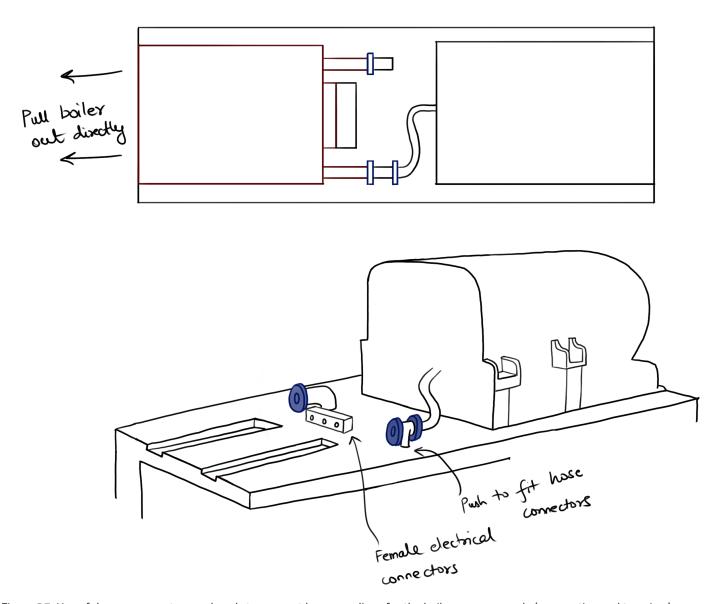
Use of drawer connectors and push-to-connect hose couplings for the boiler as an example (perspective and top view)
